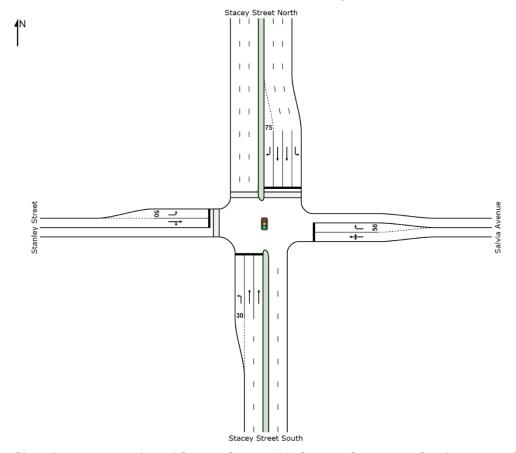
Signalised Intersection of Stacey Street with Stanley Street and Salvia Avenue (SIDRA)
